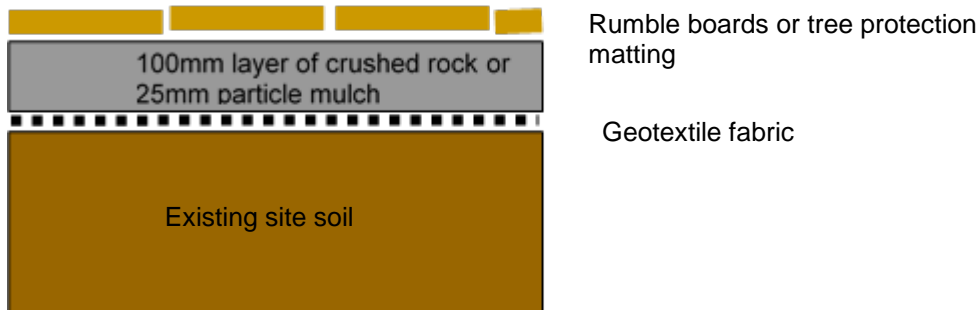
Indicative ground protection system - adapted from AS4970 Clause 4.5.3 Ground protection
